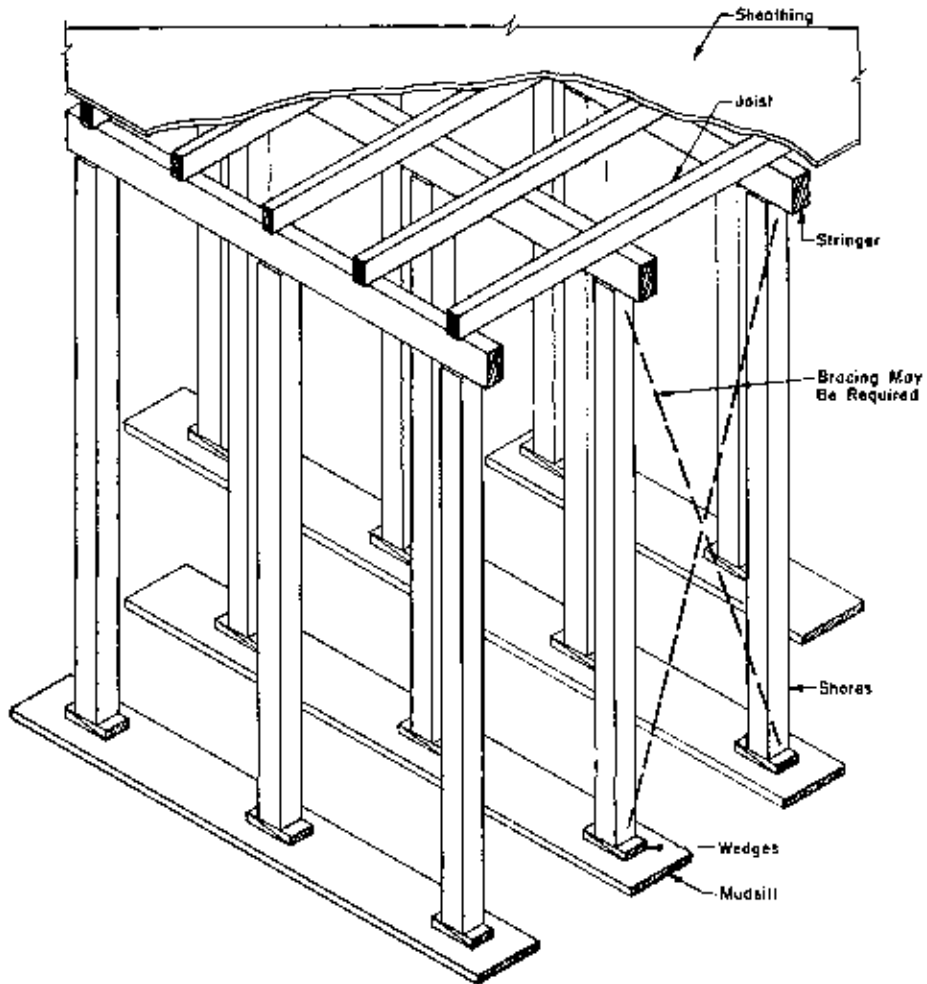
Form for elevated slab. (Courtesy of American Concrete Institute)
